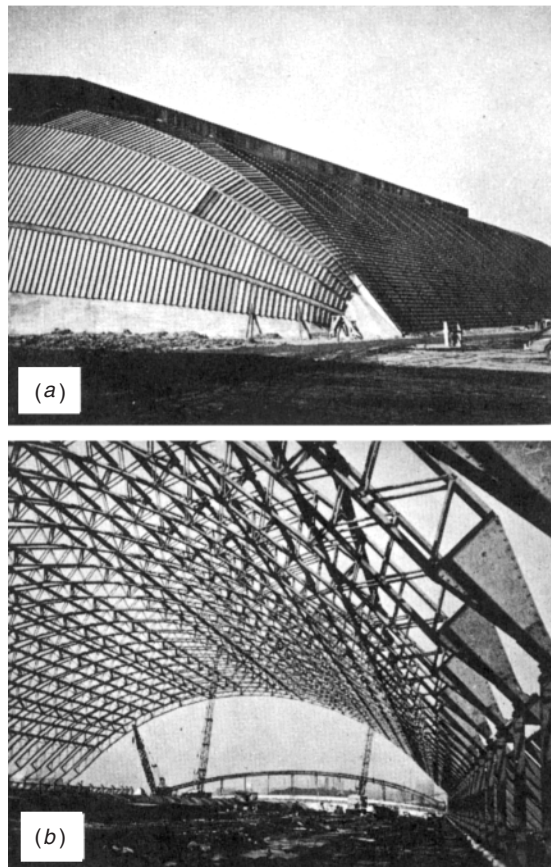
Cold-formed steel sections used in space frames. (Courtesy of Unistrut Corporation.)
